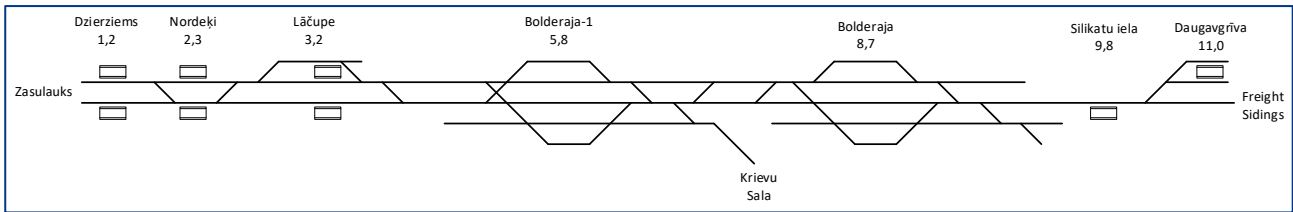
FUTURE TRACK LAYOUT FOR LINE SECTION ZASULAUKS – DAUGAVGRĪVA
